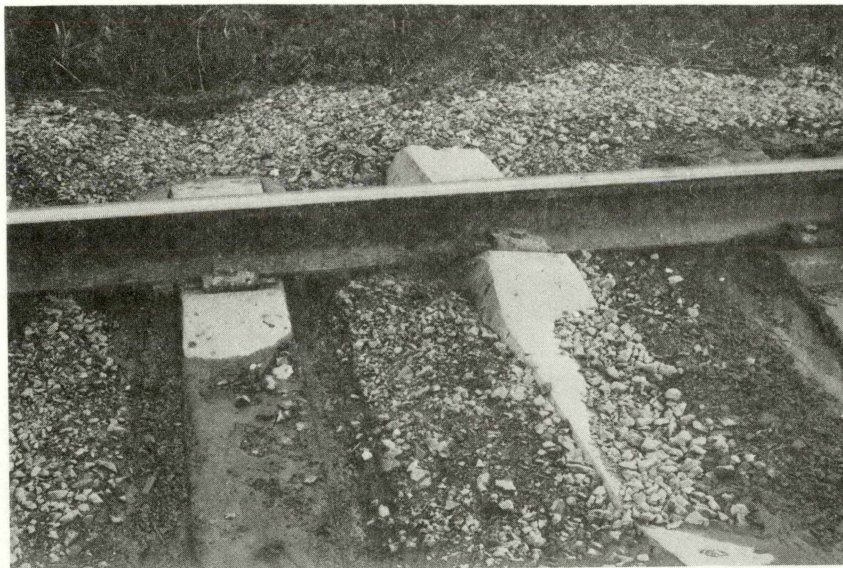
Deterioration of ballast around alternate ties installed on first pass of tie renewal operation. Center tie installed on second pass forced to carry excessive load and cracked. (2)
